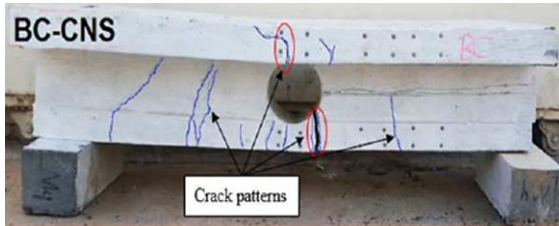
Crack patterns of a beam with a horizontal circular opening [29]
